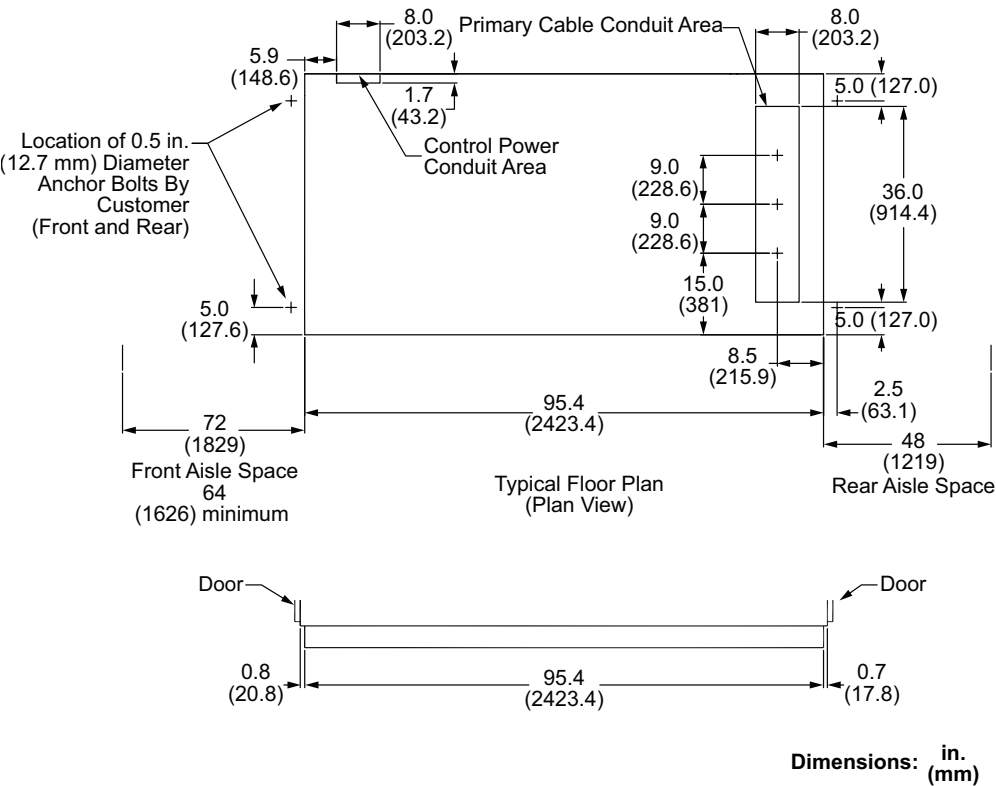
Typical Floor Plan—36 in. (914 mm) Wide Unit (not for construction)
